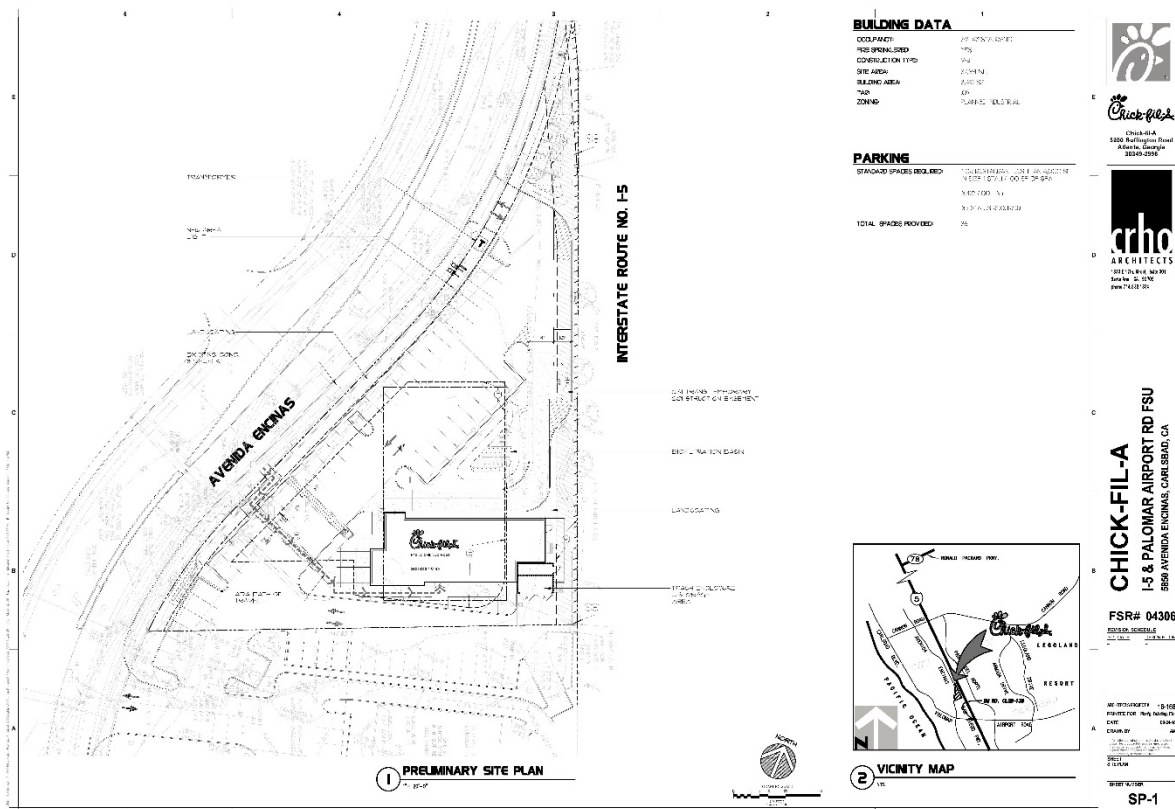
Preliminary Site Plan – Chick-fil-A Carlsbad
